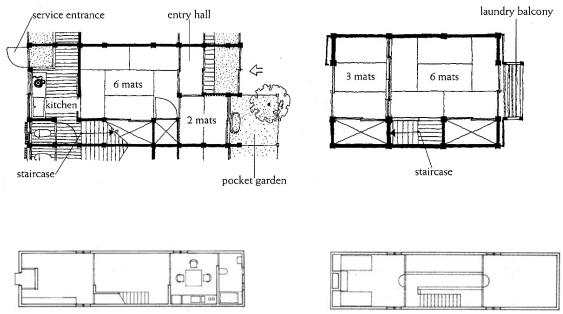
Azuma House plans compared to traditional Japanese row house
